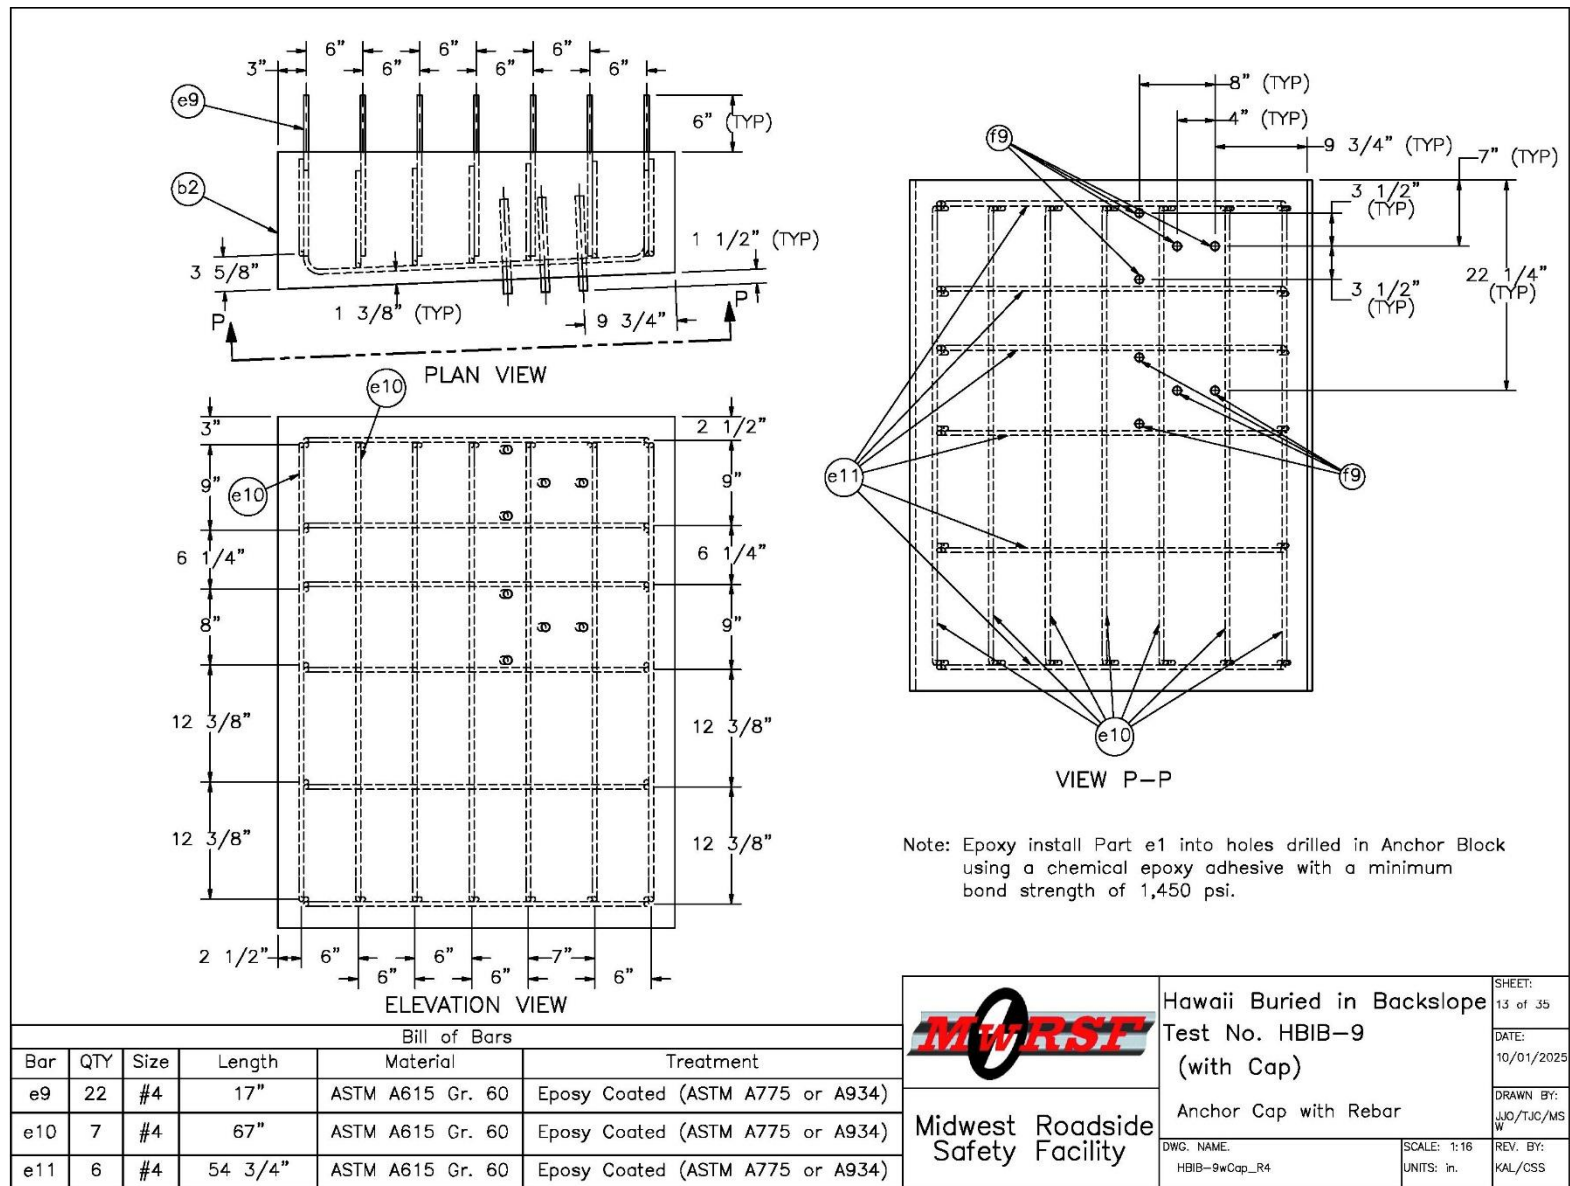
Anchor Cap with Rebar Details, Test No. HBIB-9
